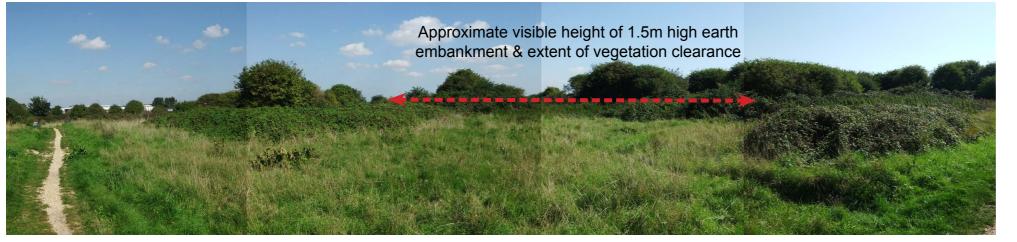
from the informal path crossing the Common, heading northwest towards Eastern Road. View looking northeast at the southern extent of the proposed northern embankment
